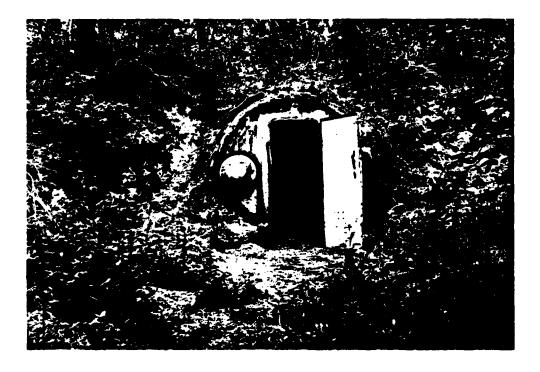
View of fallout shelter built for Kennedys, Station Lake Worth Inlet.
